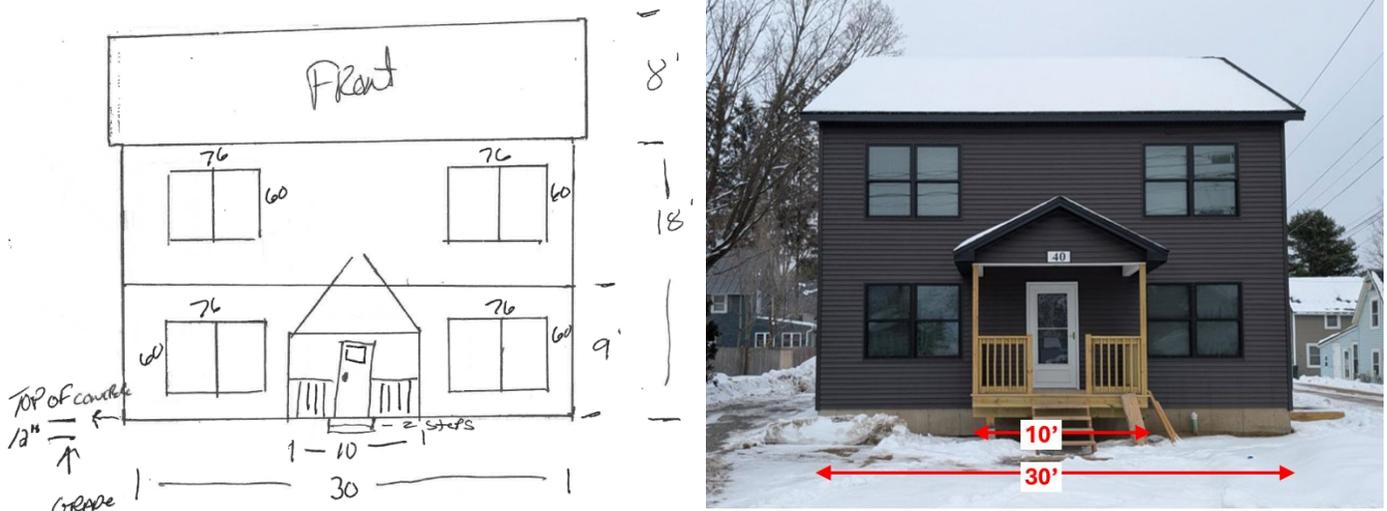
South elevation. Left: Submitted site plan; Right: As-Built Photograph.
